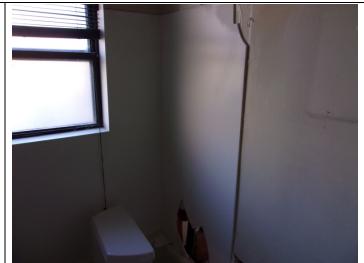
Typical view of the shower stall caulk in buildings 1-6 & 36-38.
